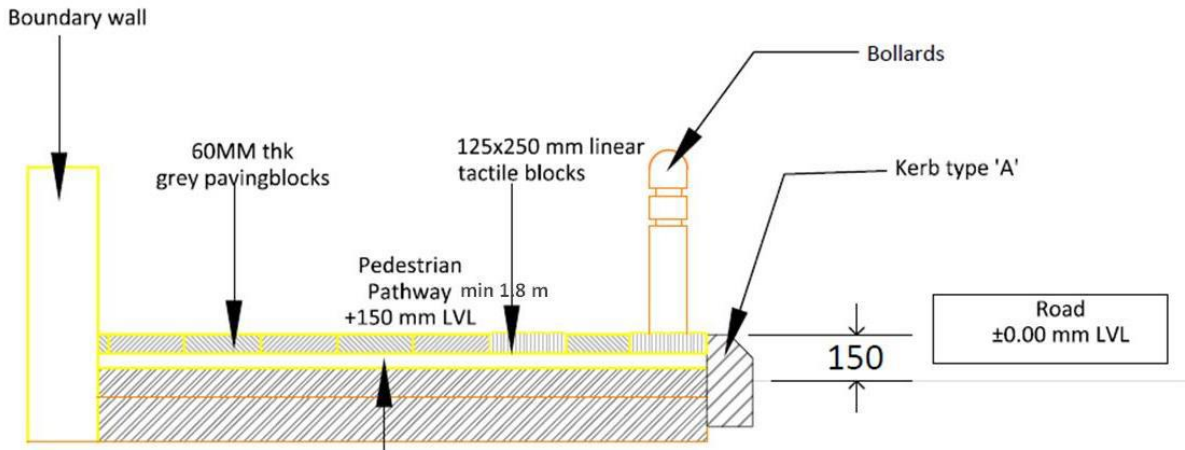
DETAILED CROSS SECTION OF FOOTPATH DESIGN
